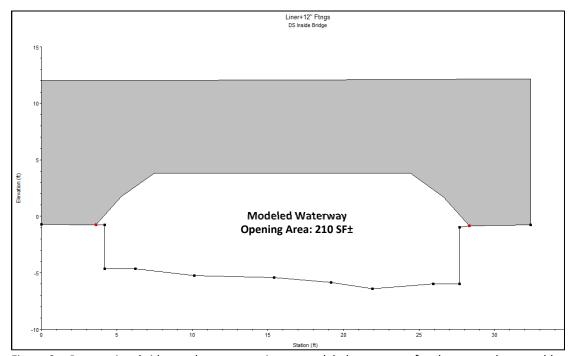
Post-project bridge outlet cross-section as modeled to account for the areas obstructed by the geopolymer liner and sewer main and the area added by removing portions of the concrete footings
